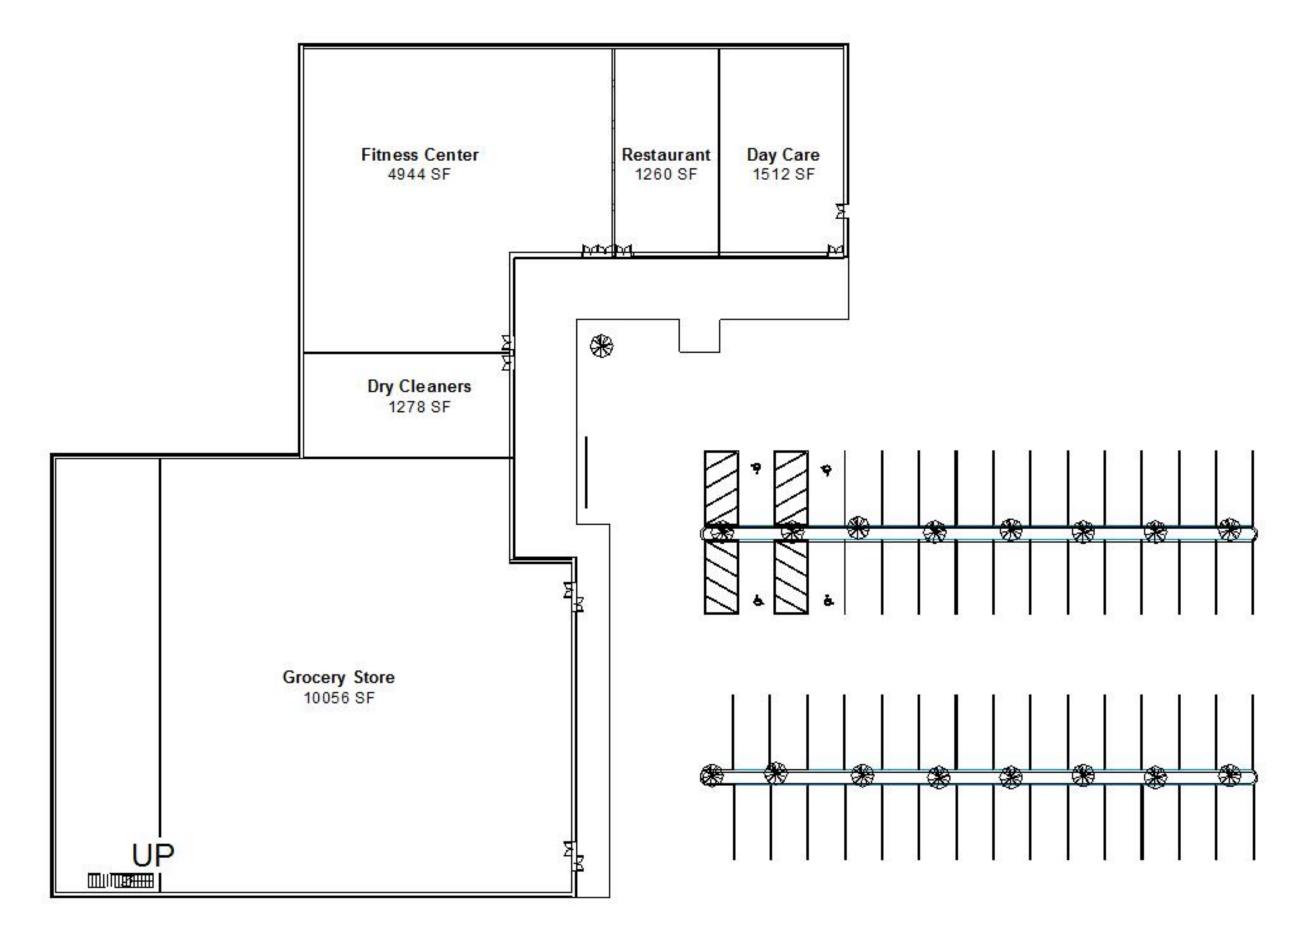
Chapel Street Shops Proposed Floor Plan
